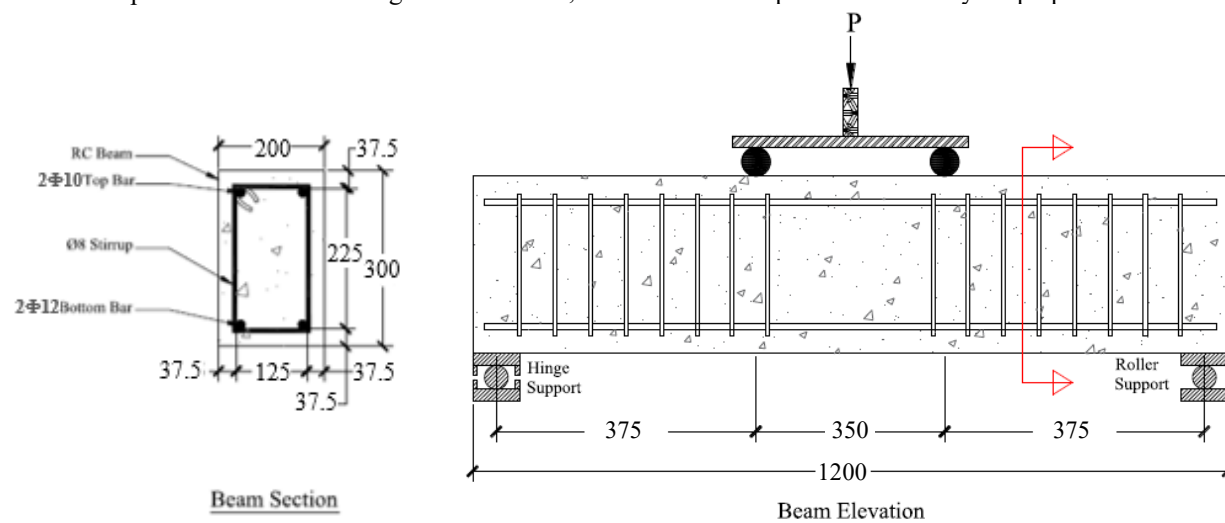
Reinforcement details and cross-section dimensions of tested beam.
